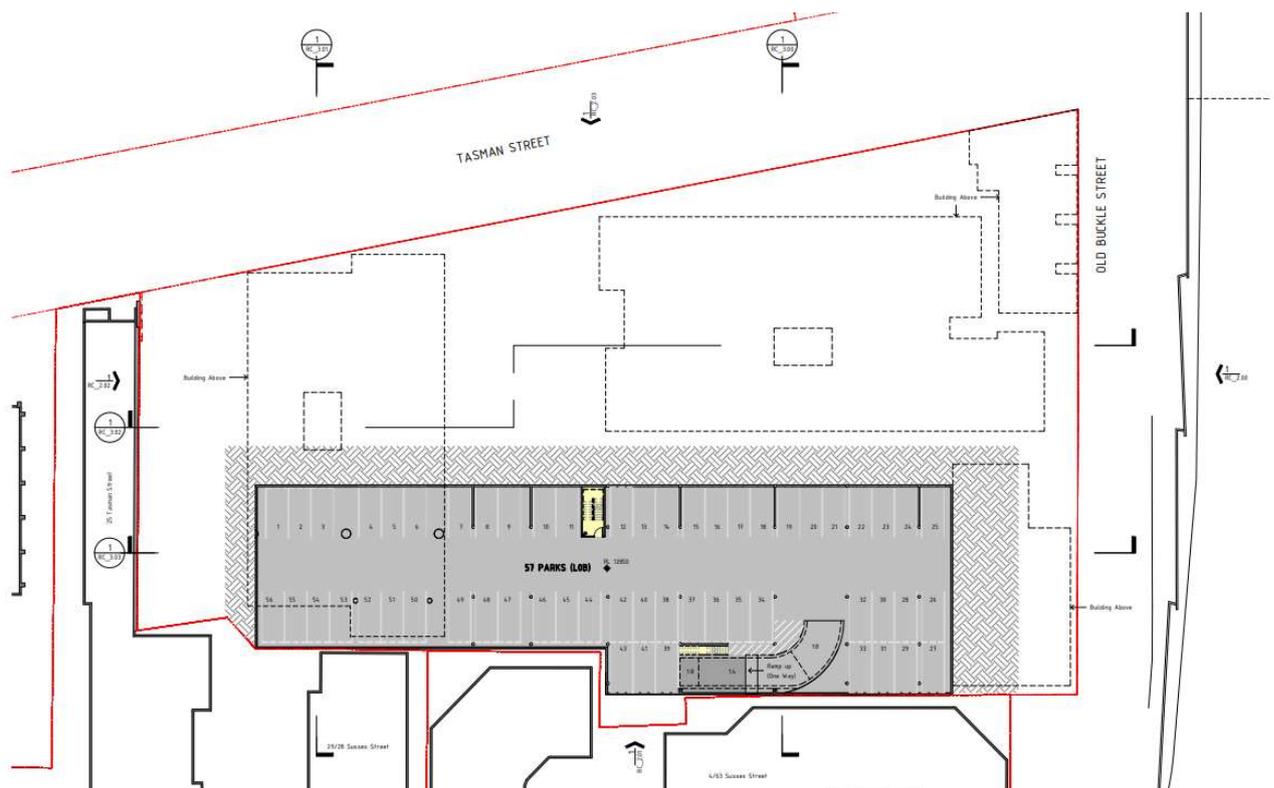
Architect's lower basement plan (received from Athfield Architects, 20 December 2022)
